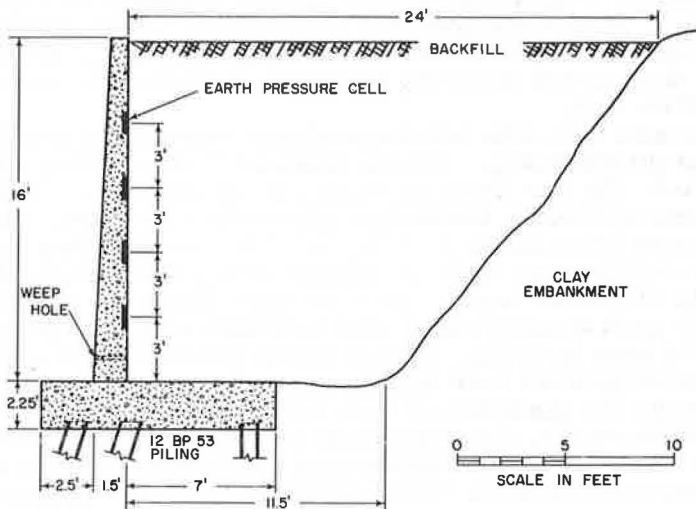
Cross section of test wall G (1 ft = 0.305 m).
